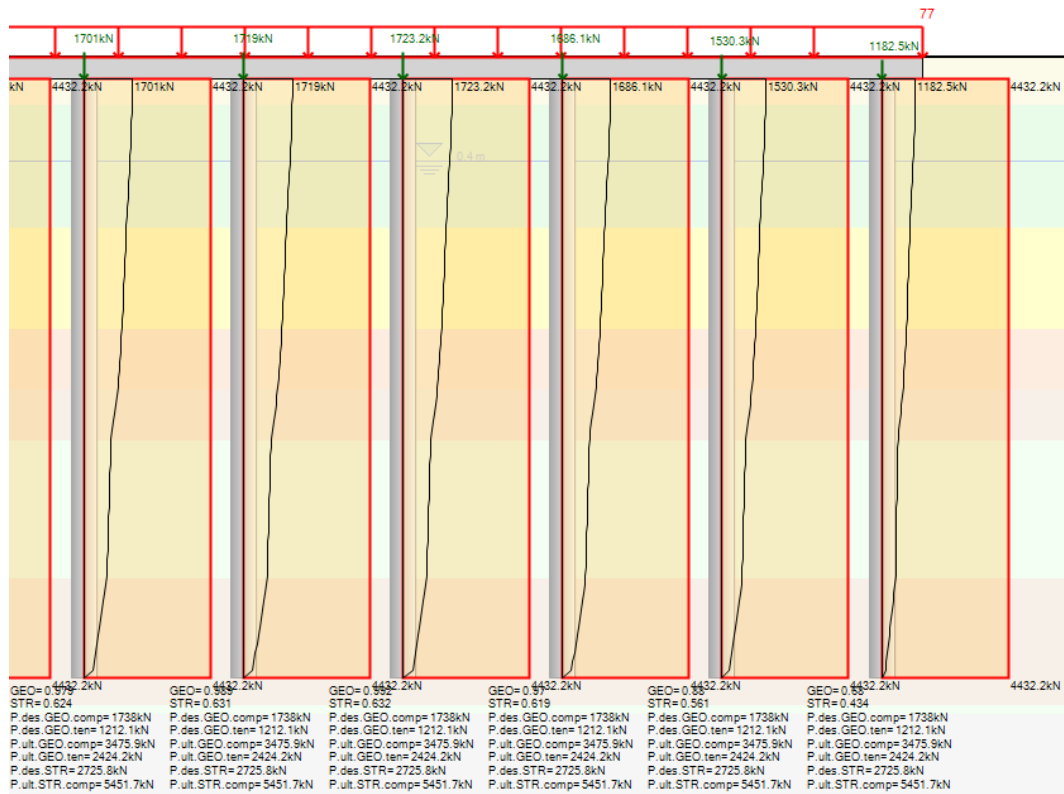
Calculated Pile Axial Forces, Load Distribution Along the Piles and Structural/Geotechnical Pile Capacities – Edge Piles
